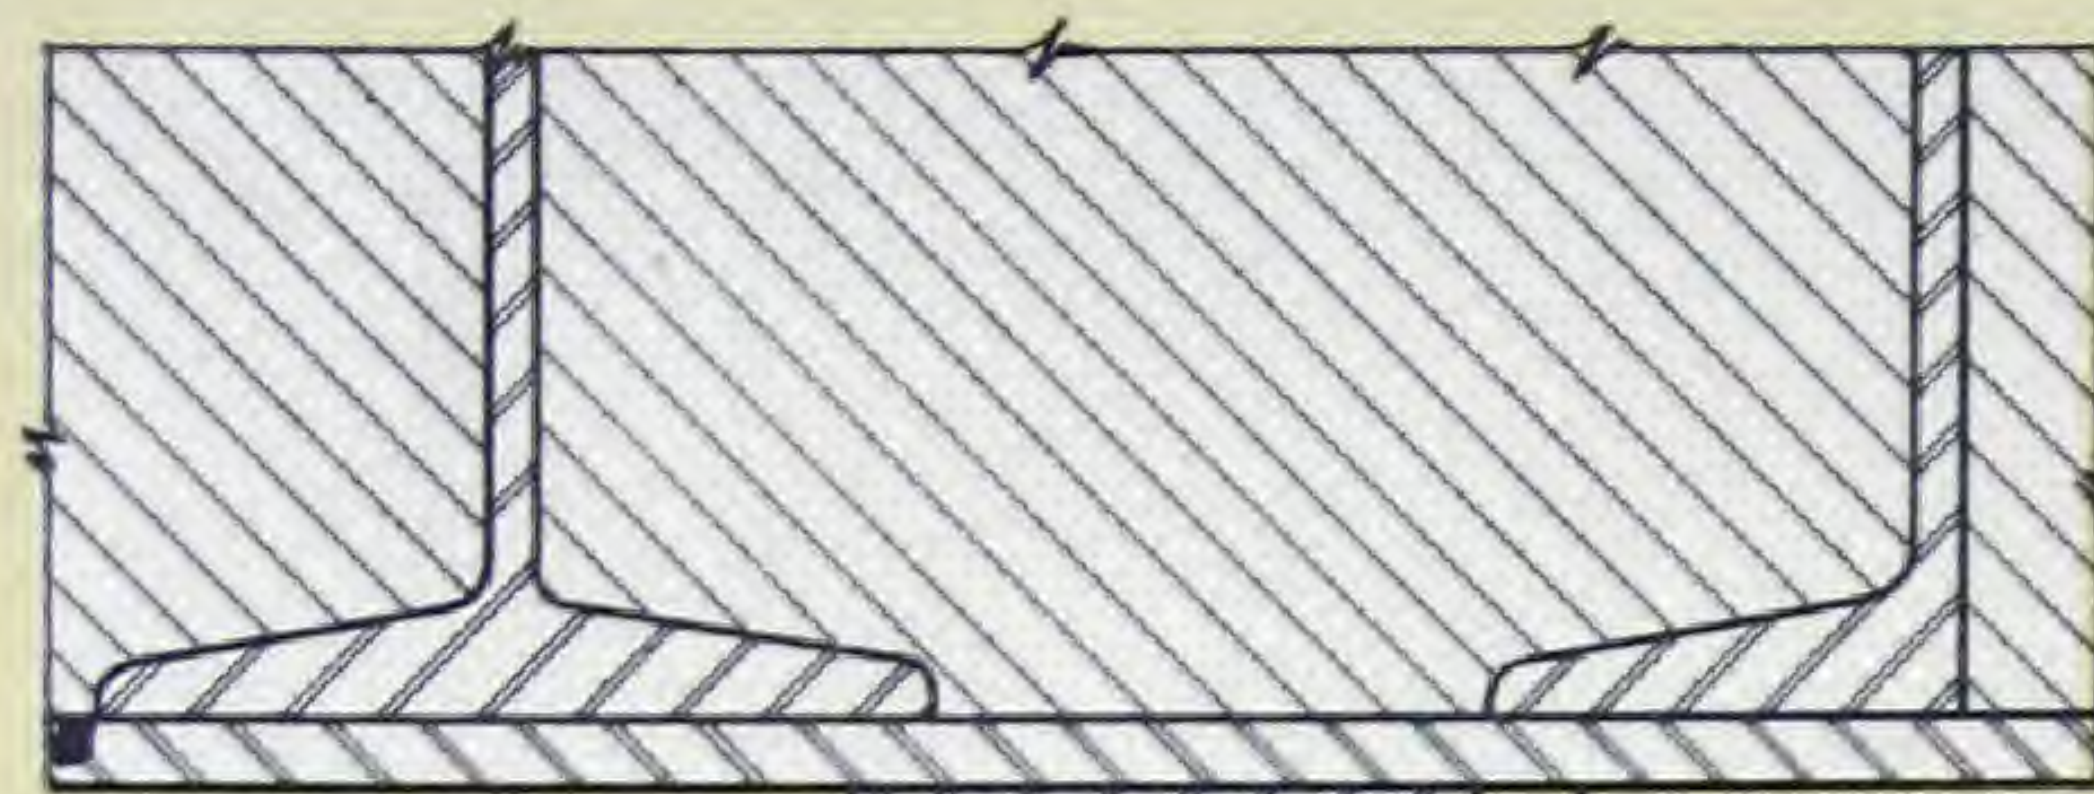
DETAILS OF COMBINATION STORM PANEL & FIXED SASH
